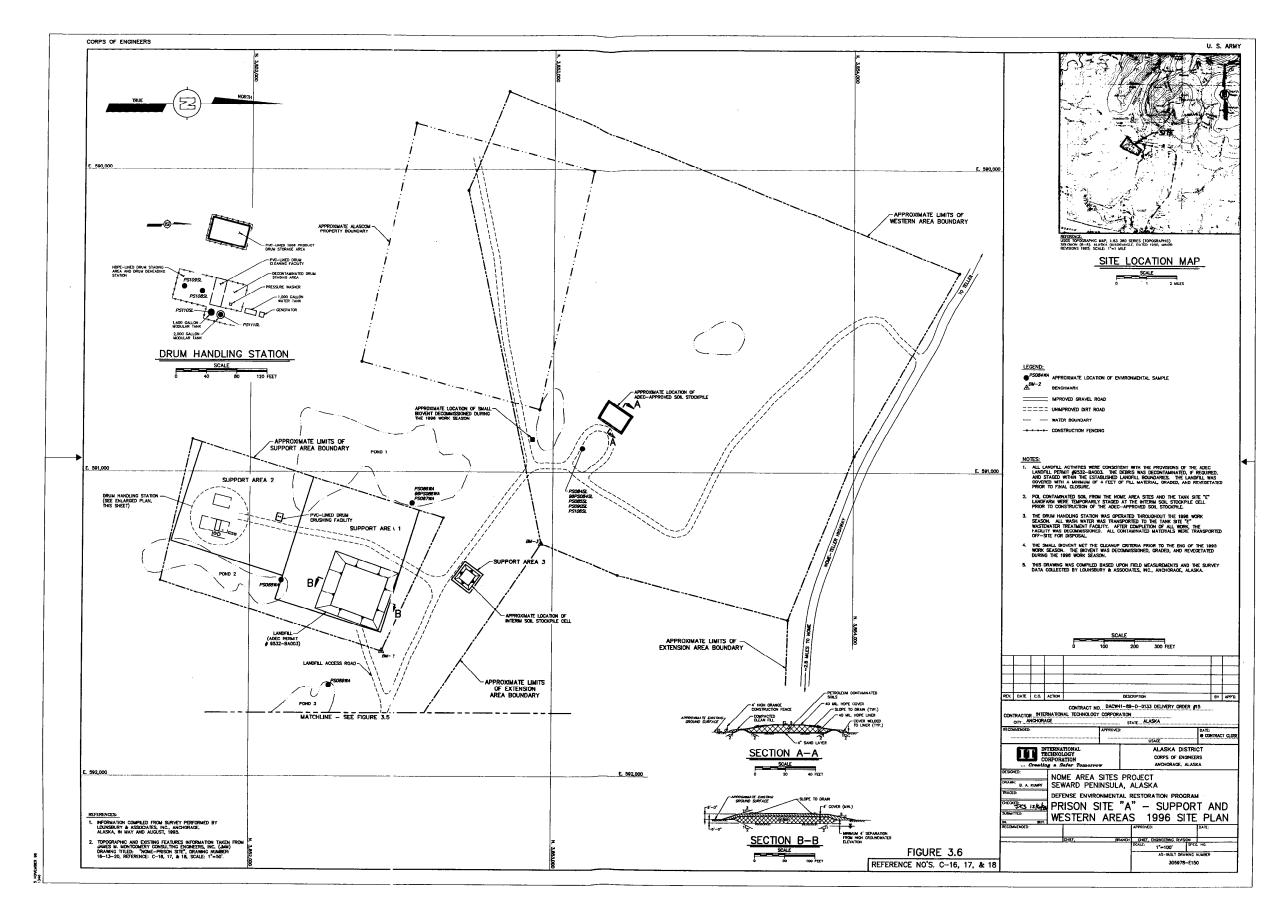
Prison Site 'A' Support and Western Areas 1996 Site Plan
